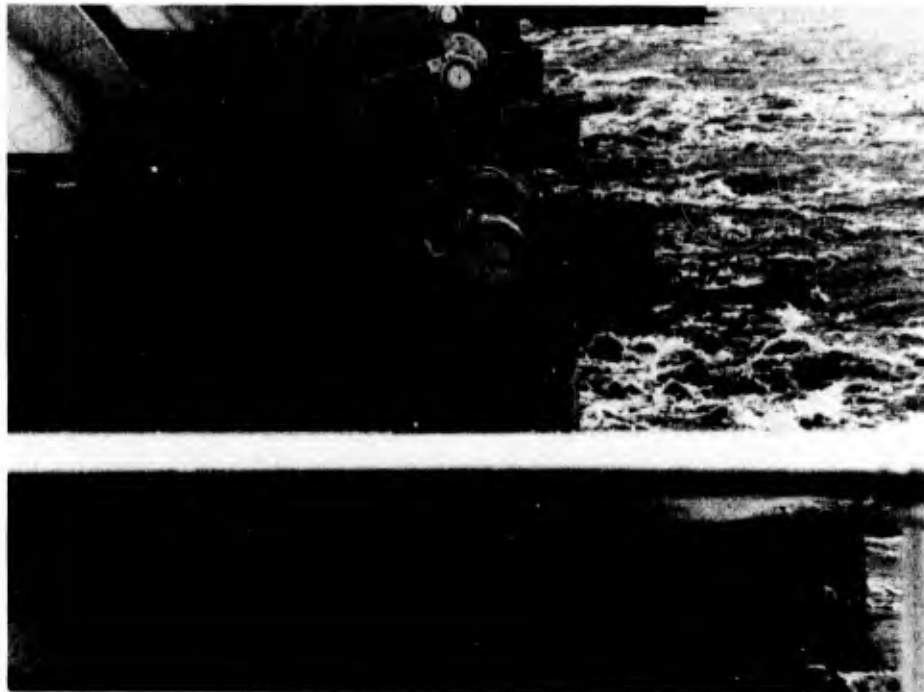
Looking across dam from pier No. 1. Typical cracking pattern with exudation downstream of trunnion shaft, pier No. 2, Lock and Dam No. 24, Mississippi River
